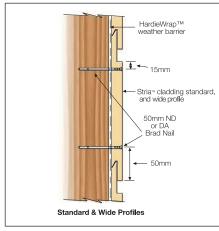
B FACE FIXING BRAD NAILS: FOR BOTH CLADDING PROFILES
